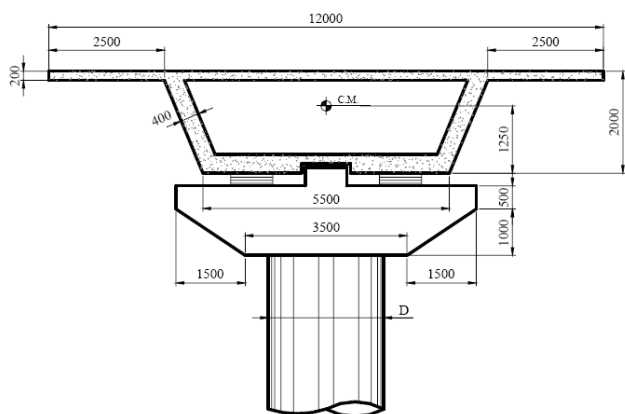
Cross-section of the deck and used piers (dimensions in millimeters) [12]
